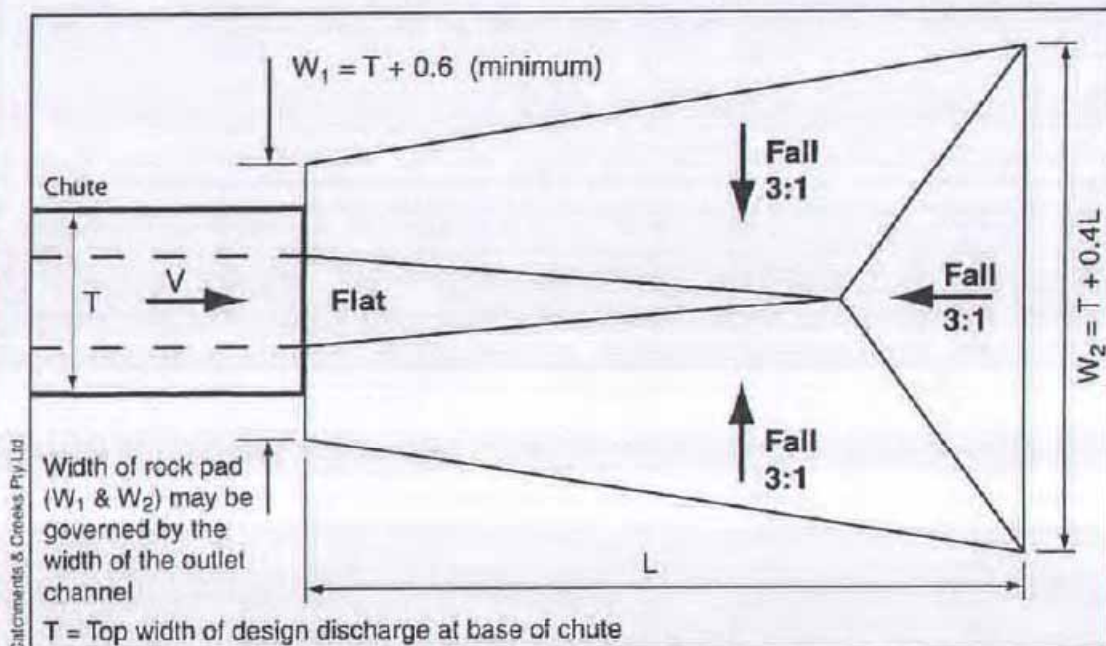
Typical arrangement of recessed outlet structure for chutes
